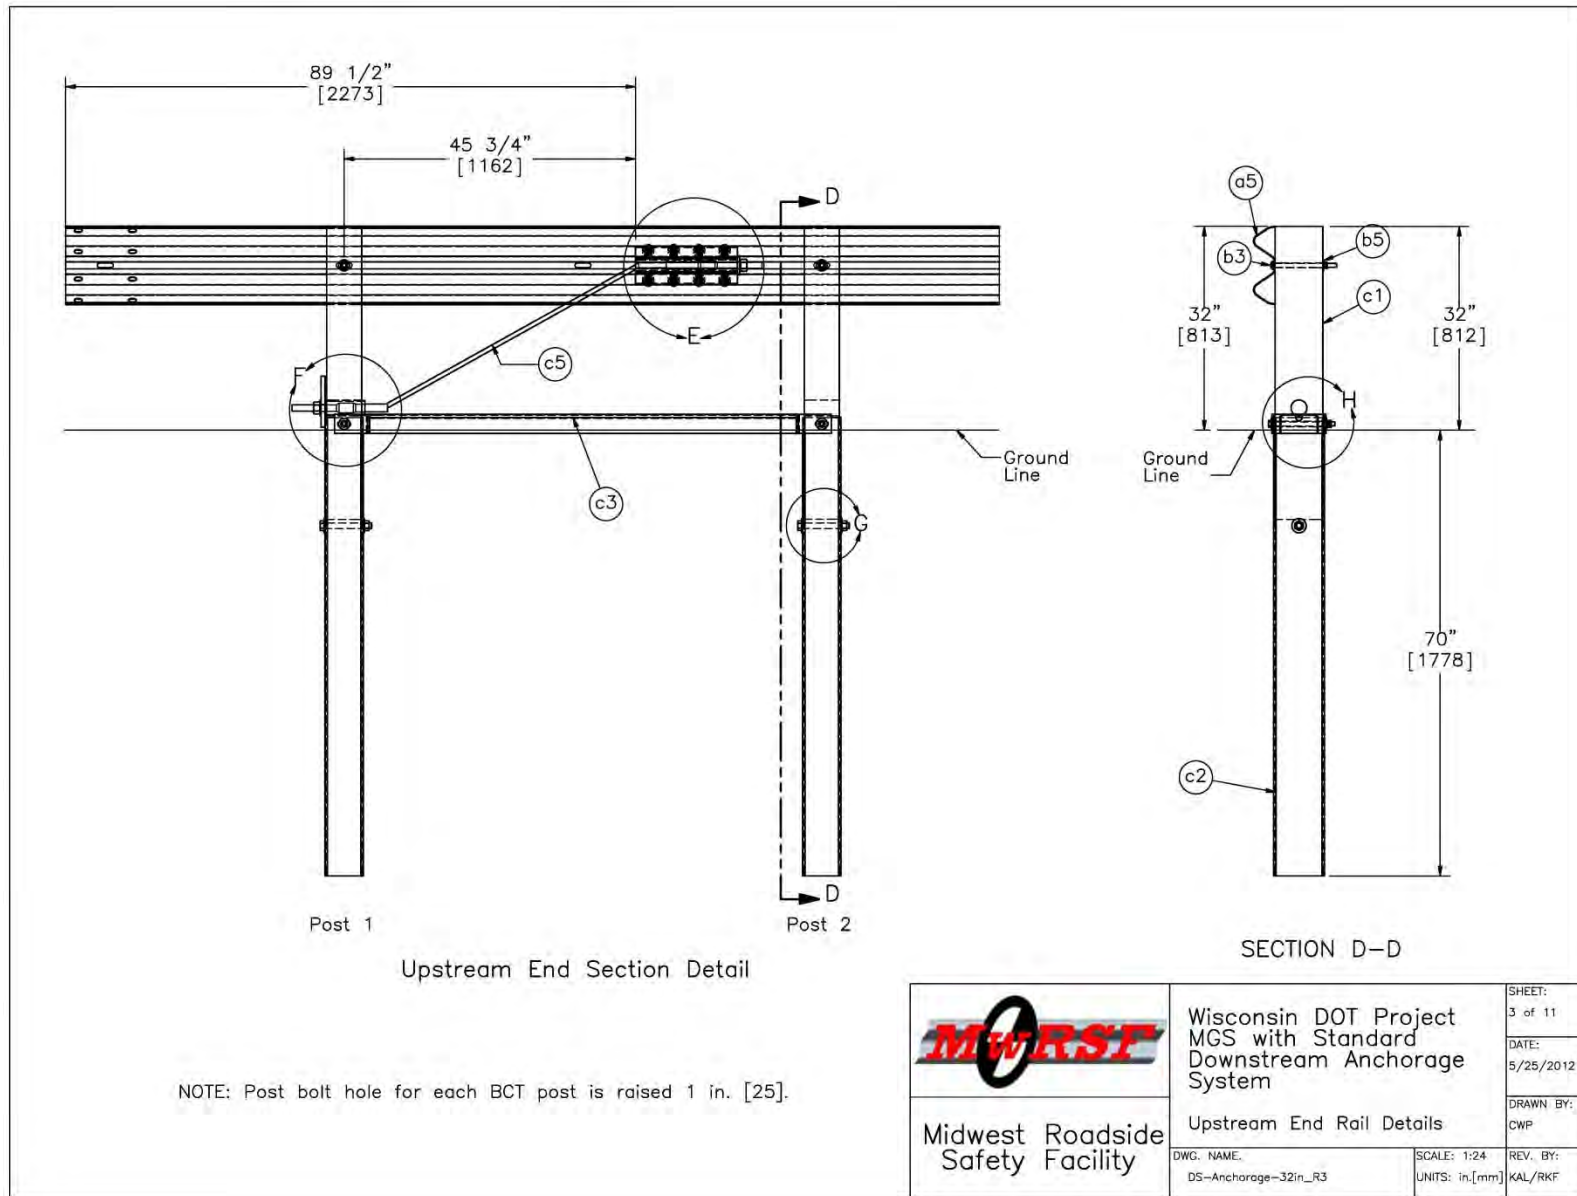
Upstream End Anchor Details, Test No. WIDA-2
